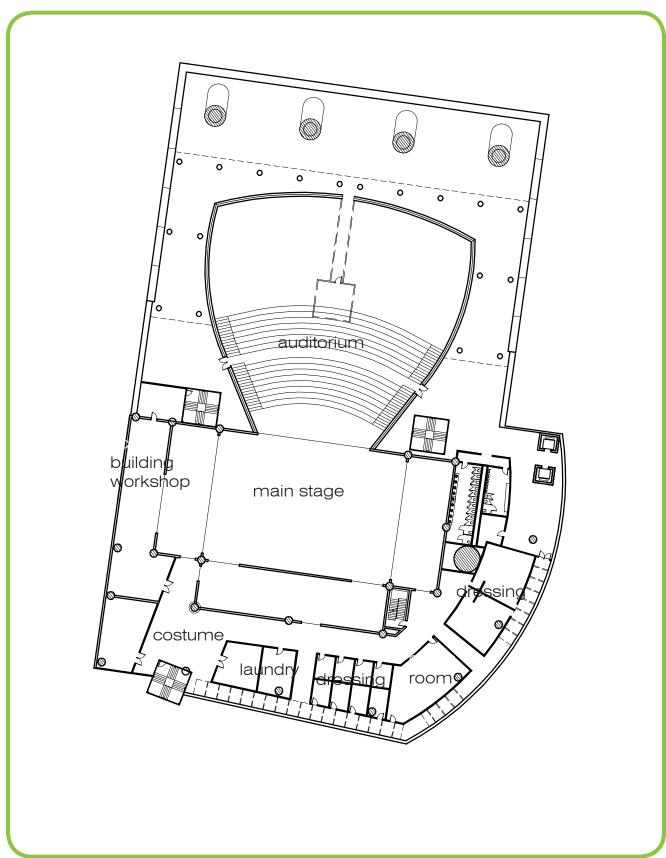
Lower Level Plan of Theater 1"=50'-0"
